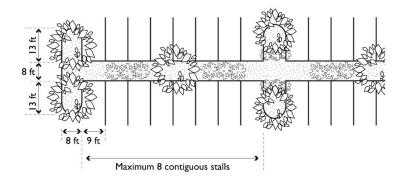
C.2: INTERIOR PARKING LOT MEDIAN DOUBLE ROW PARKING
